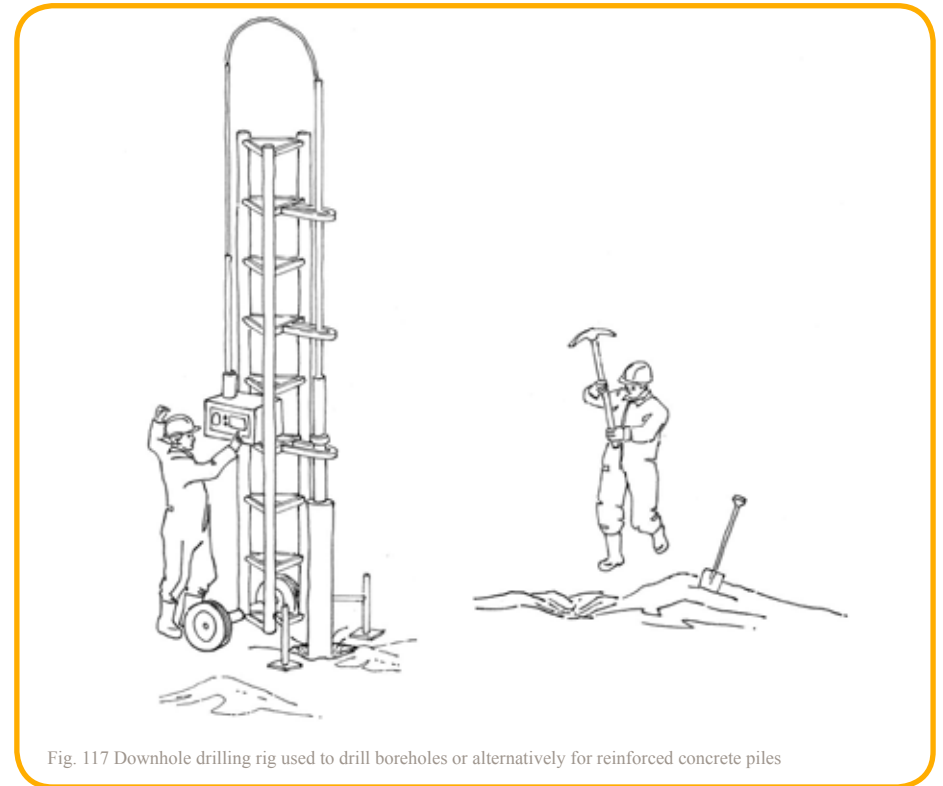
Downhole drilling rig used to drill boreholes or alternatively for reinforced concrete piles
